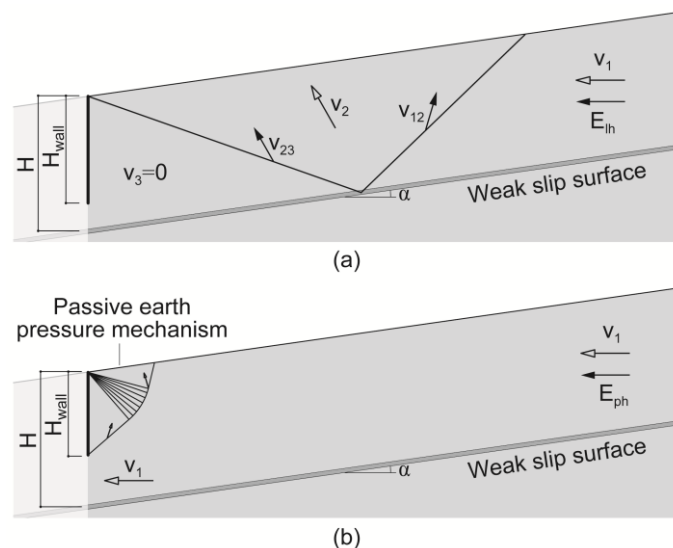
(a) Structure with large embedment evoking failure of the whole sliding layer; (b) structure with small embedment evoking a passive failure mechanism adjacent to the structure.
